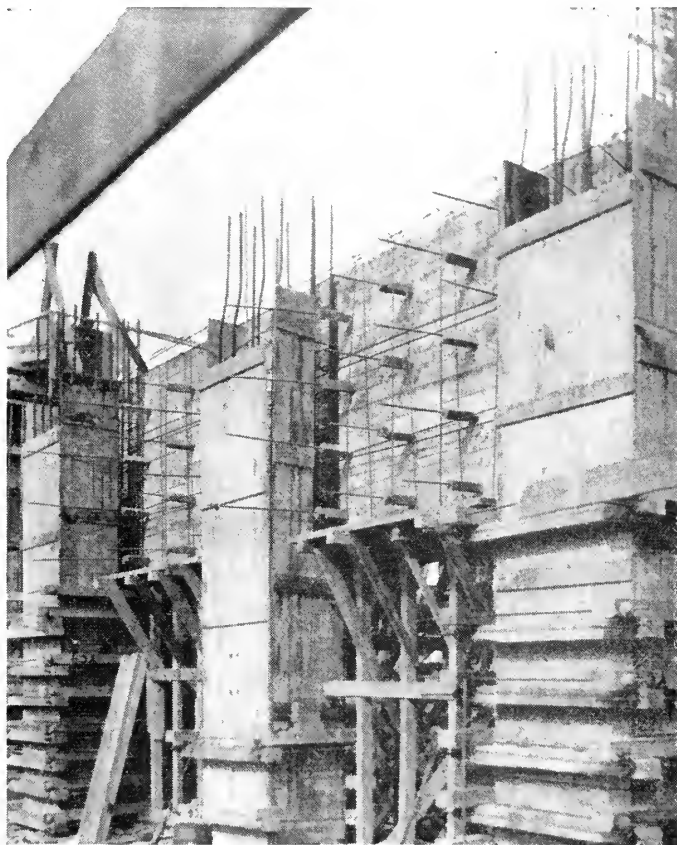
WAREHOUSE COLUMN FORMS IN PLACE.
